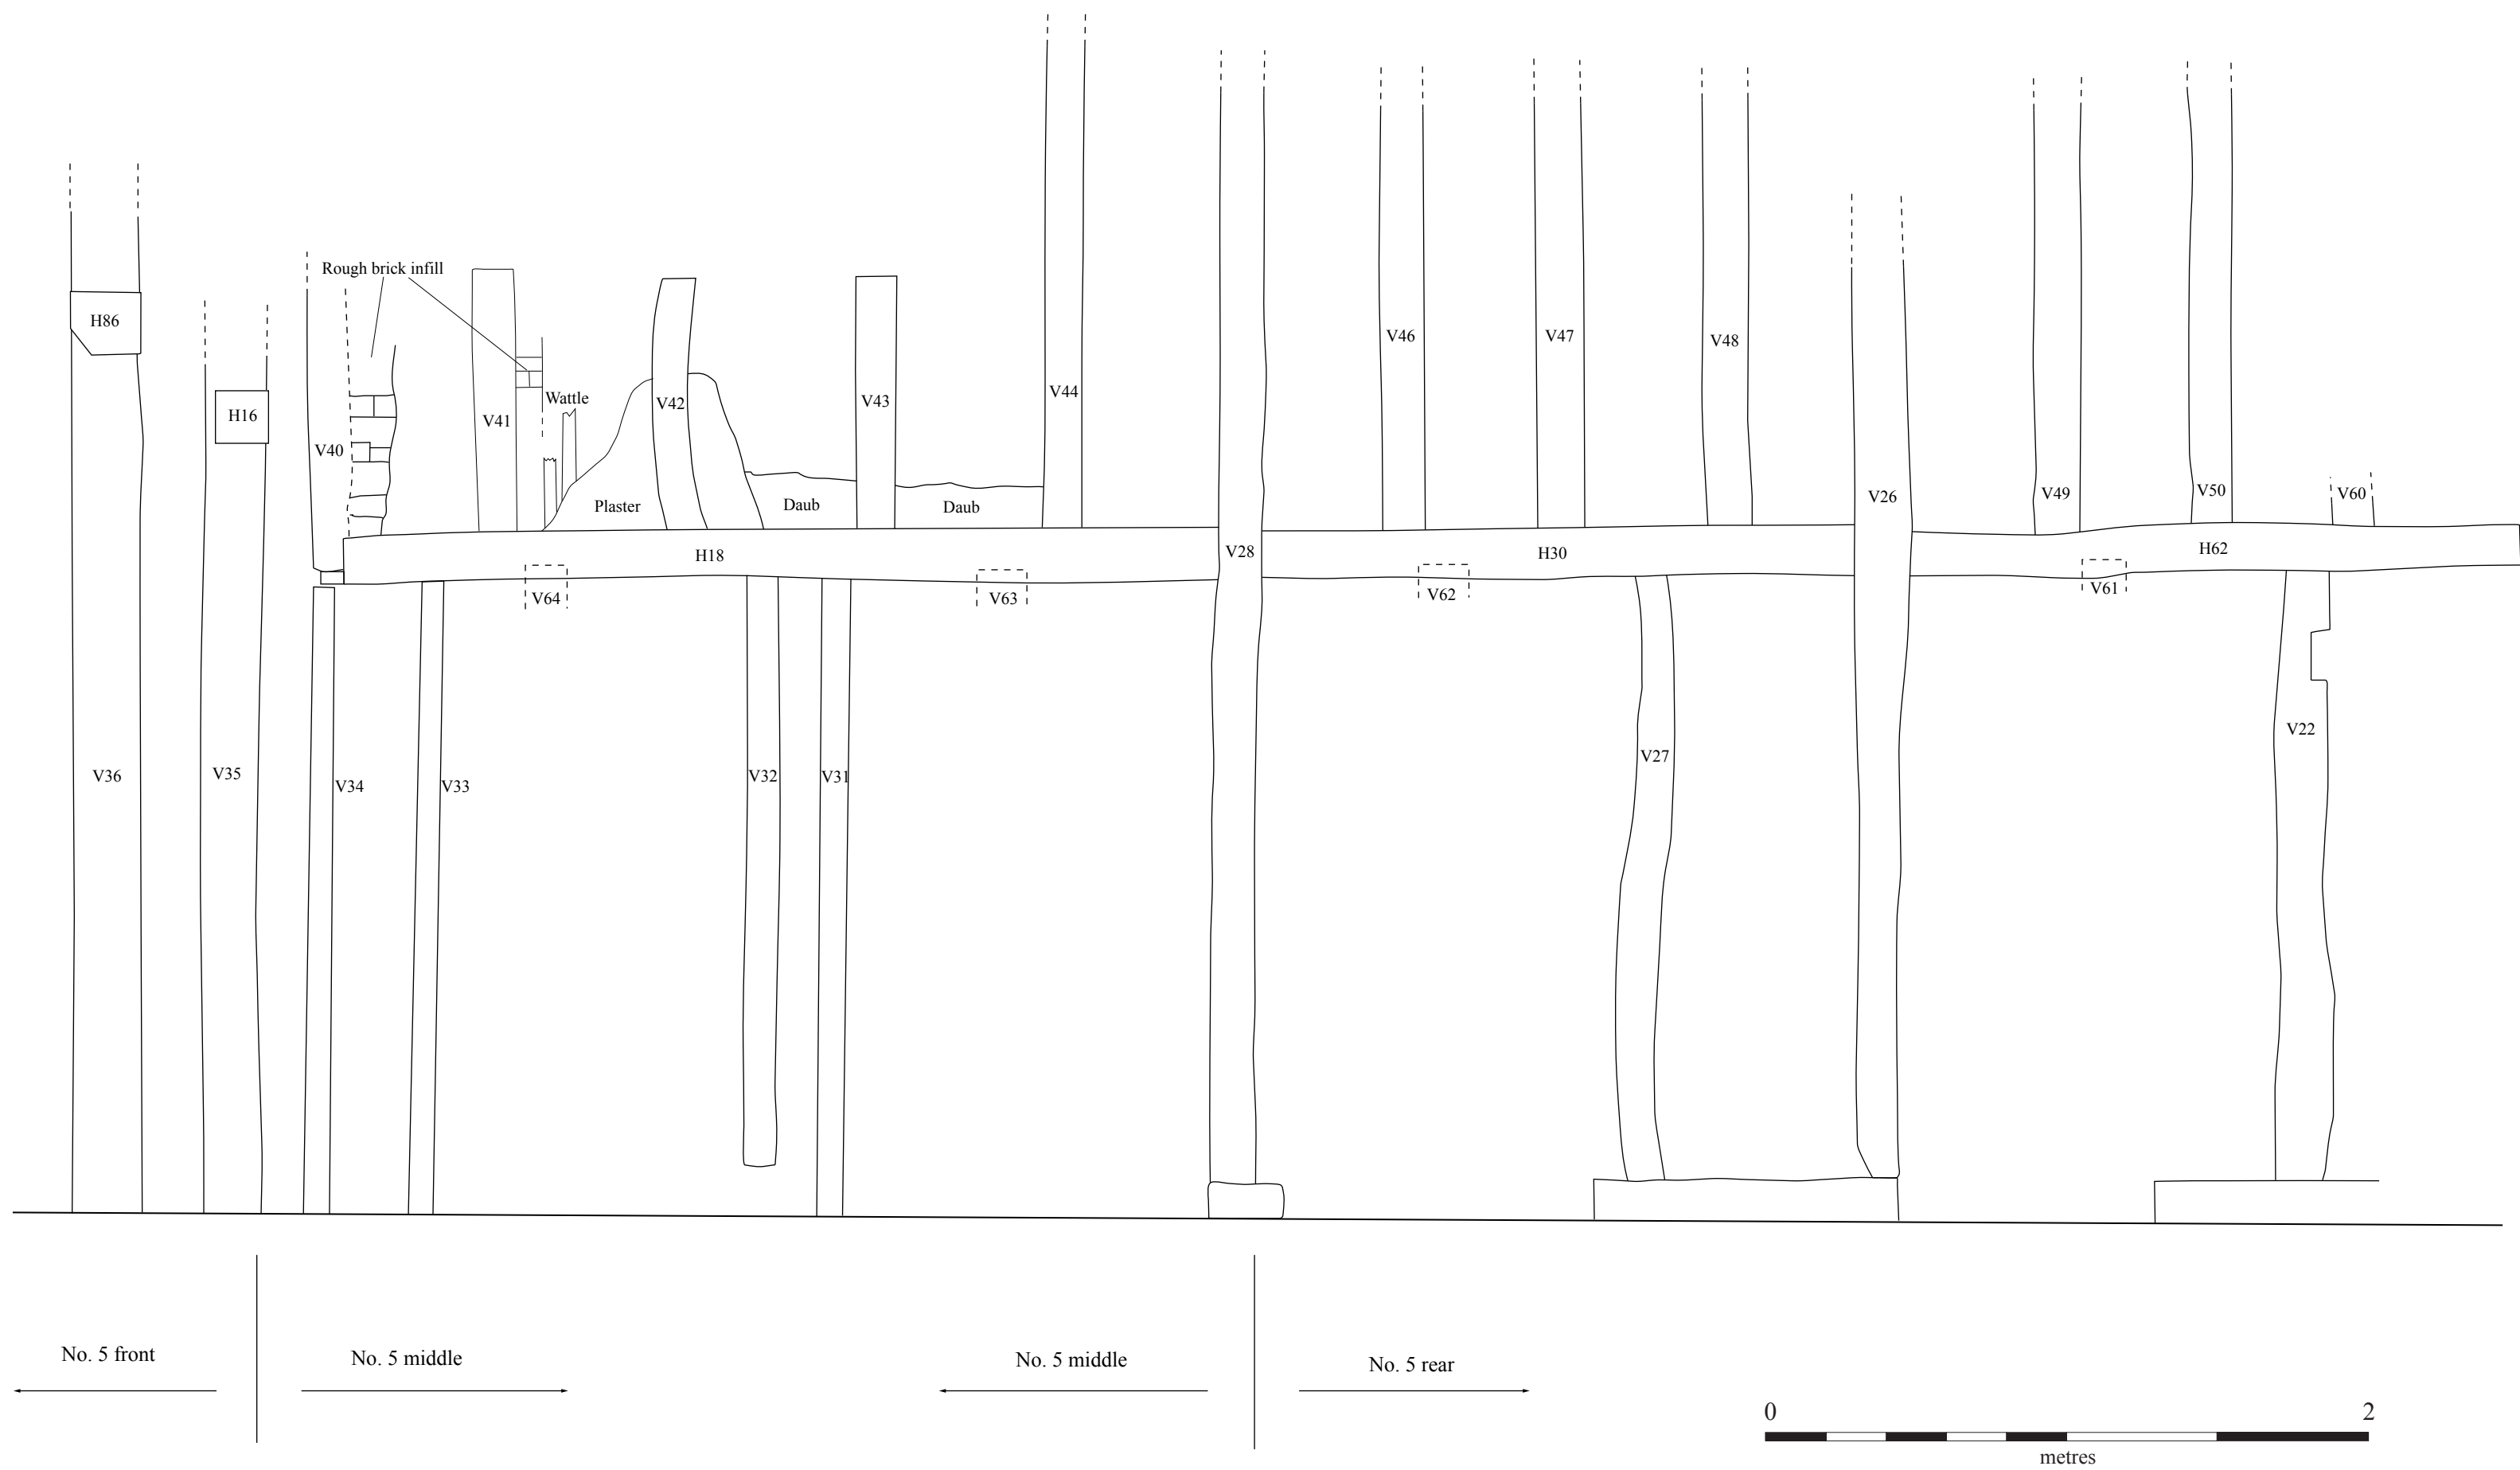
No. 5 Peas Hill, North facing elevation of north wall (scale 1:20)
